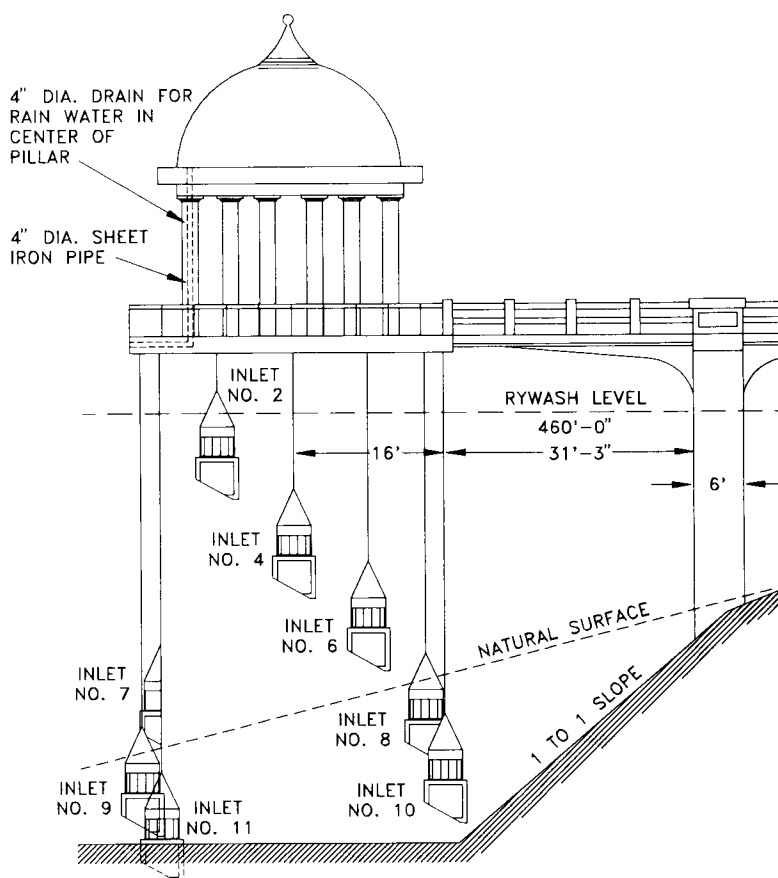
Inlet tower of Maroondah Reservoir, Australia (Ritchie, 1947).
